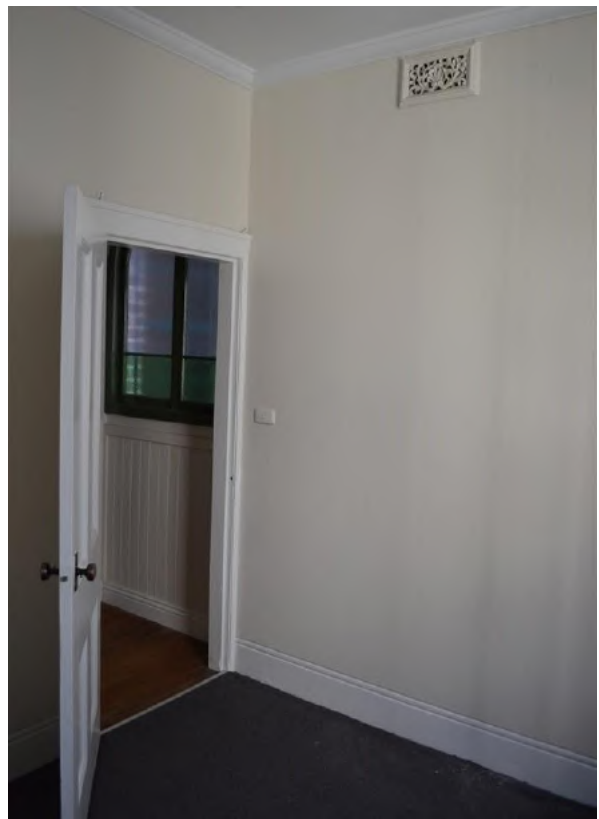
Rear bedroom (space G.6) showing the decorative plaster wall vent, plaster board ceiling and original door frame, with four panel timber door to the infilled former porch (space G.4)—50 / 46–56 Gloucester Street. (Source: GML Heritage, June 2016)
